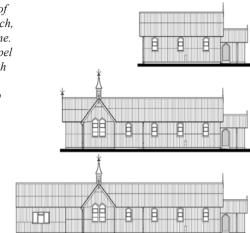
North elevation of St Fillan's Episcopal Church, showing extension over time. (top:) 1876 – original chapel 3 bays long with west porch (middle:) 1885 – crossing section and 1 bay added to the chapel (bottom:) 1969 – meeting room extension added.
